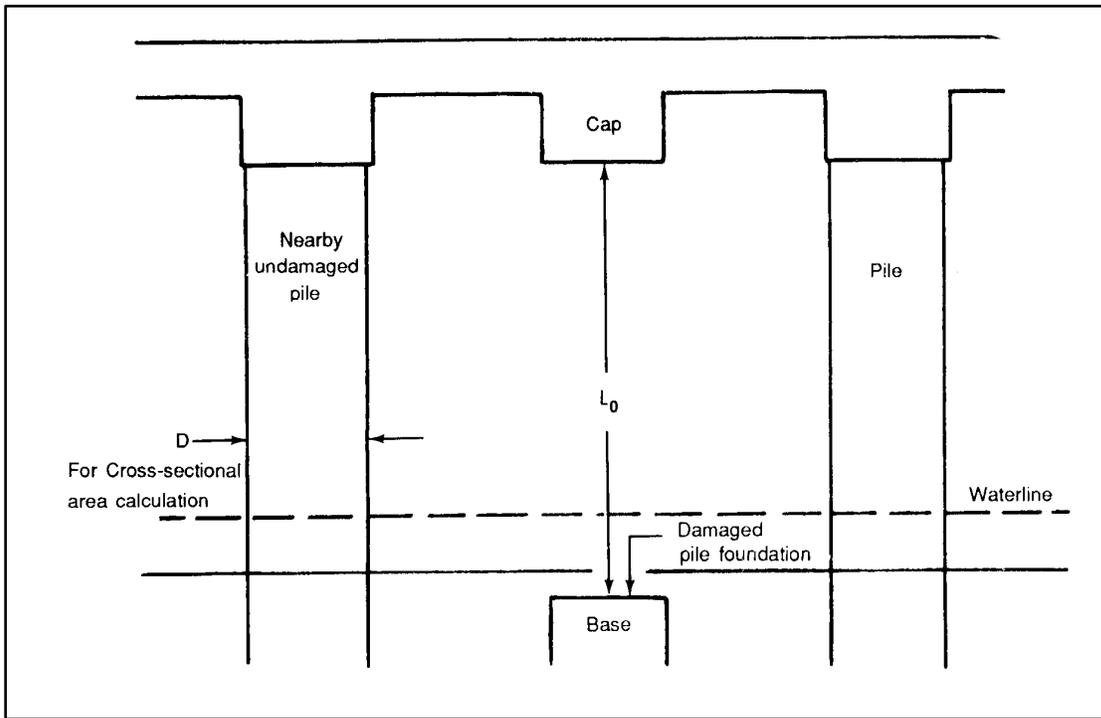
Structural elements of pier or wharf with damaged pile
